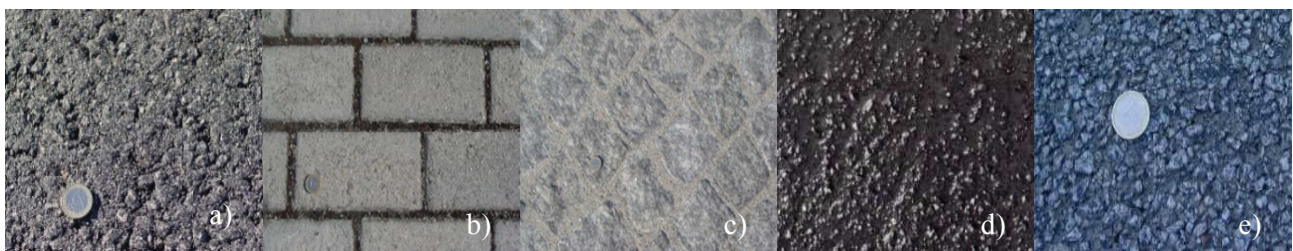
Pavement surfaces: a) asphalt concrete(AC); b) concrete blocks (CB); c) cobble stones (CS); d) slurry seal (SS); e) open graded rubber asphalt (OGRA).
